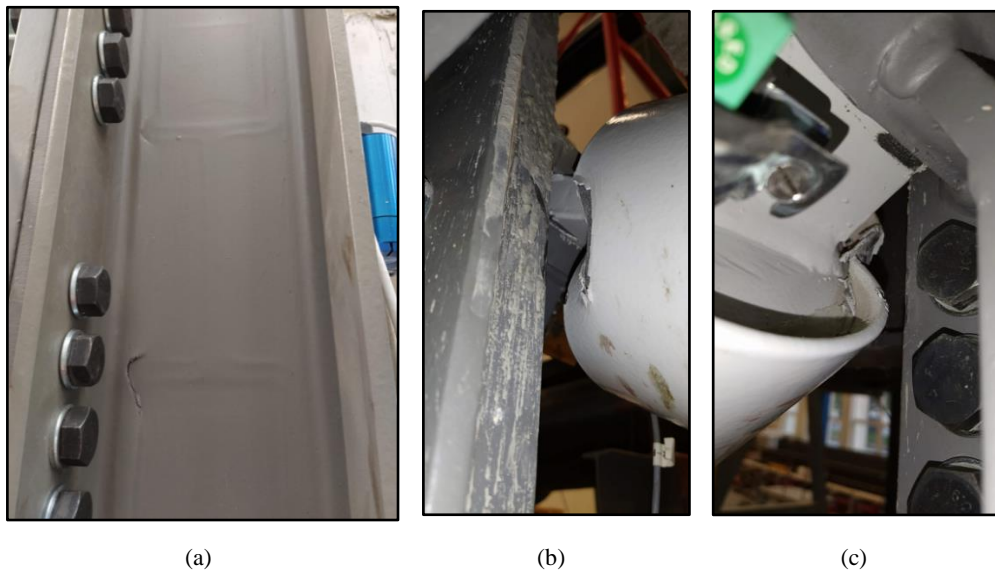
Failure modes: (a) Crack in the column web; (b), (c) Contact between BRBs and columns
